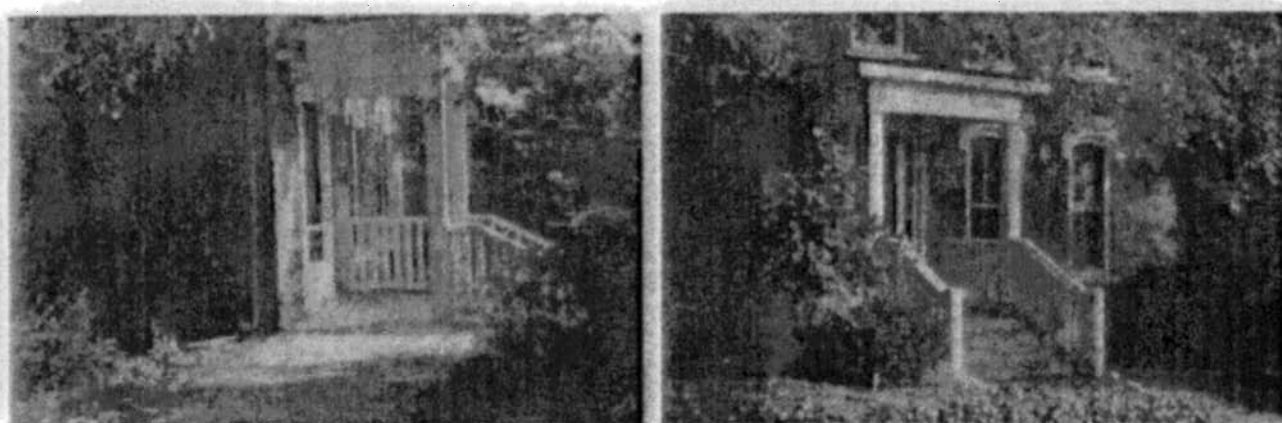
When a porch is used as a wheelchair accessible entrance, it may be possible to retain the historic stairs by adding a ramp parallel to the building. Through plantings and some re-grading, the new ramp built parallel to the building (left) allows retention of the historic stairs and does not impact the historic character of the entrance (right). Photo: Iowa State University Extension.
